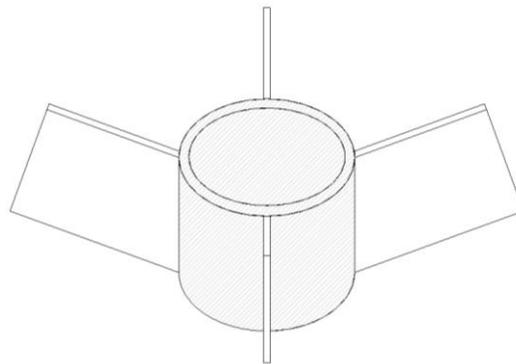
Steel Plates Welded to Steel Ring Connection
